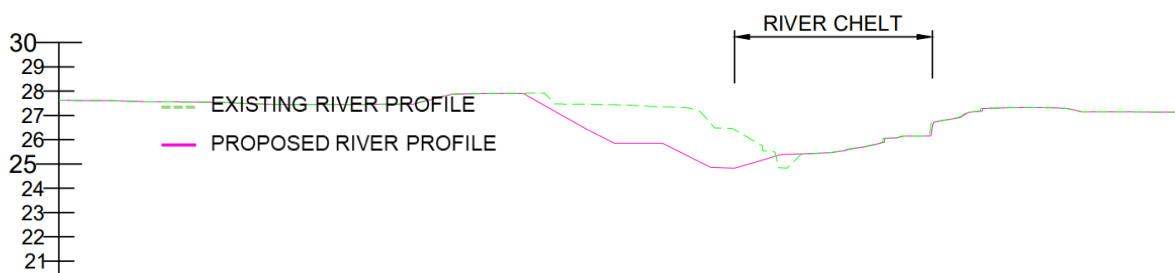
Cross-section of riverbank reprofiling proposed in Scheme design
